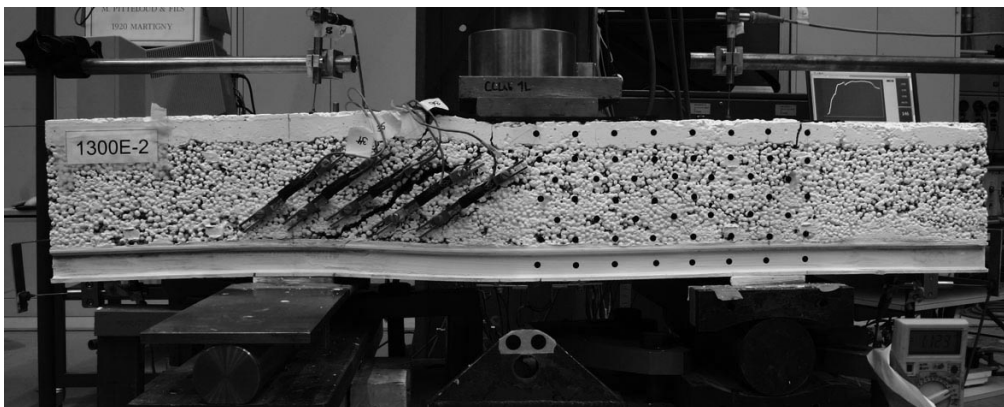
1300Es-2: Failure process on west side (north left, south right).
